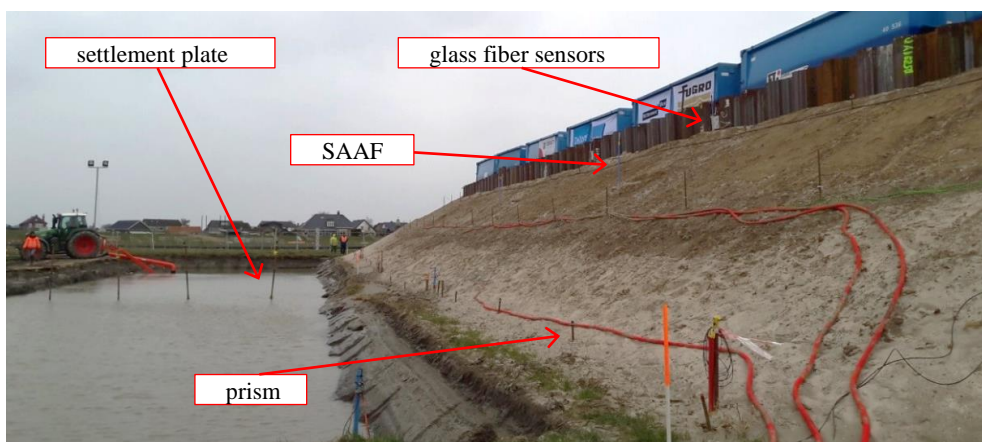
Monitoring campaign FST on (non-)reinforced test levee
